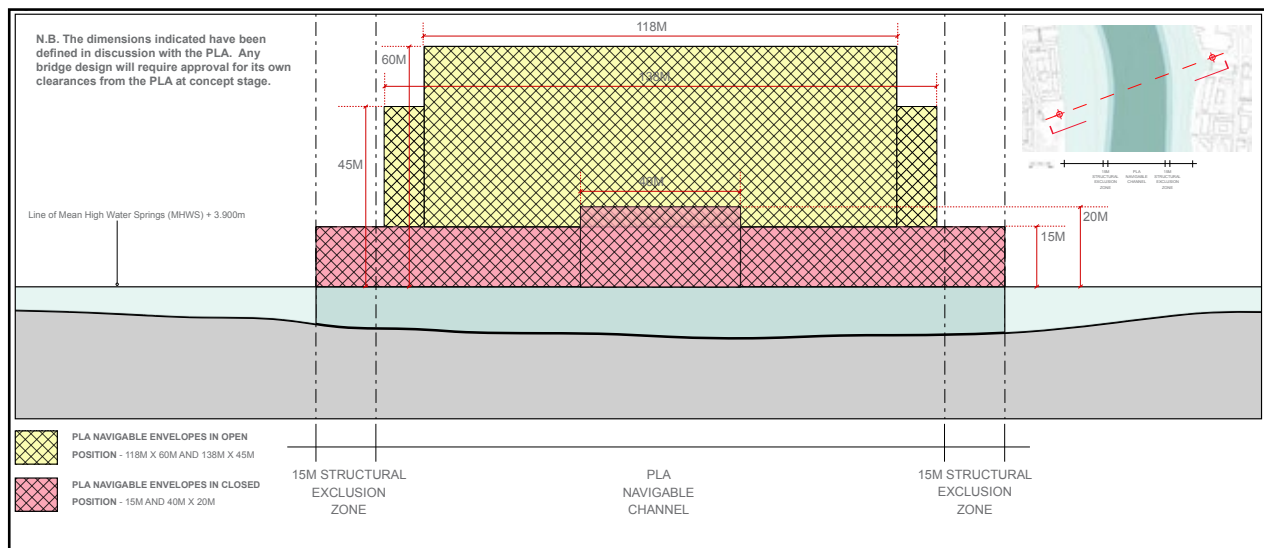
Proposed bridge geometries (cross section) from Chapter 3: Site Parameters and Constraints, Part 1
